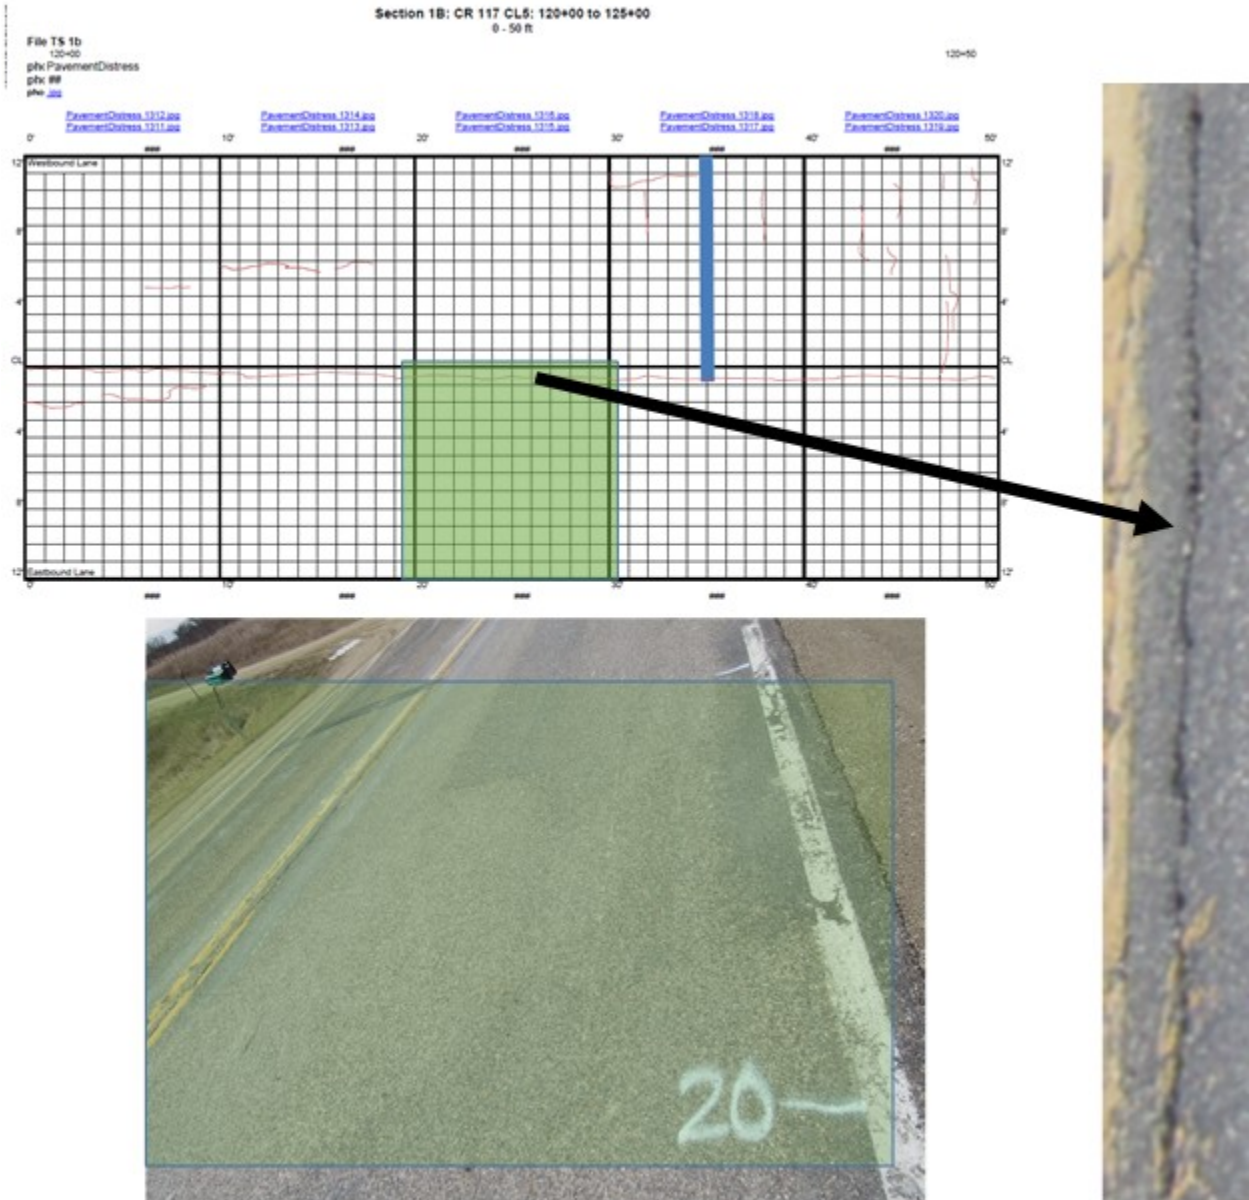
Centerline Construction Joint Deterioration and Cracking, Section 1B
